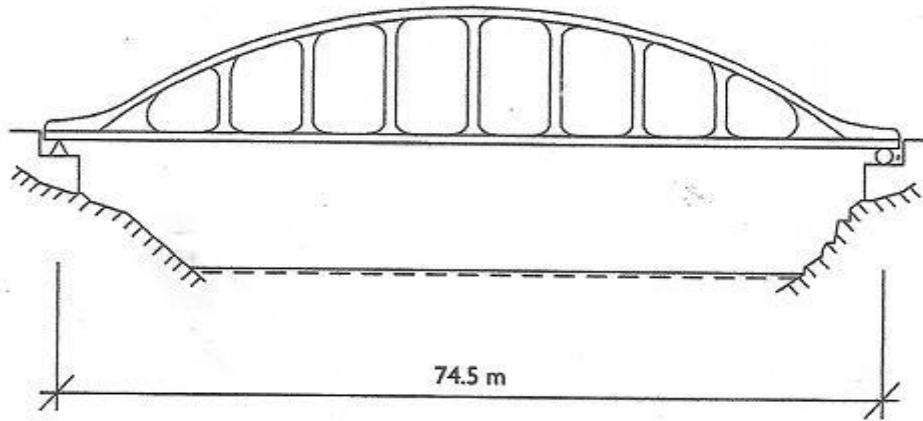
Hasselt Bridge in Profile (Akesson 2008)
